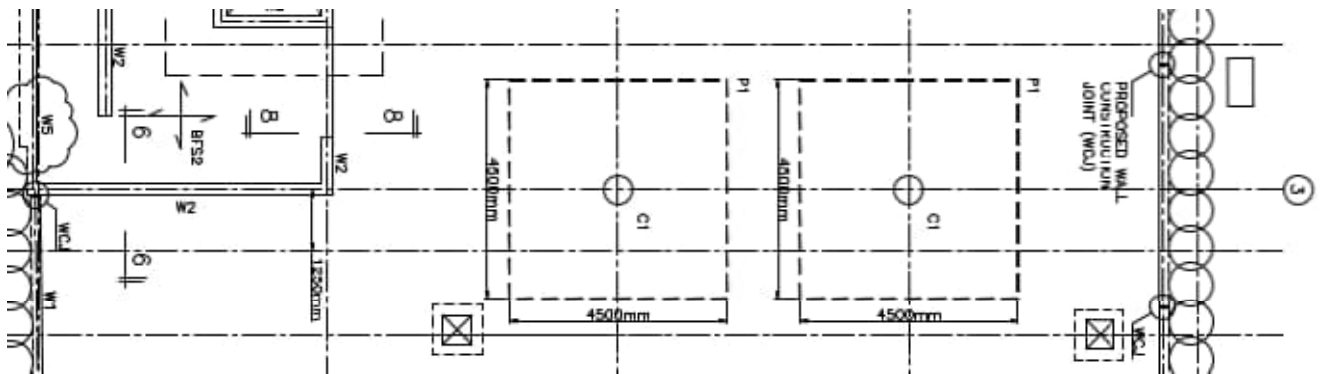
Extract of Aercap House from drawing 3762-C-101-3 Proposed level - 2 Foundation Plan General Arrangement
